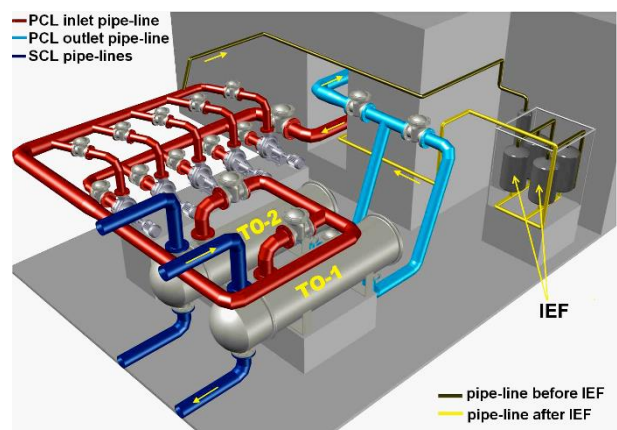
Layout of equipment in the PCL pump-premise (TO-1, TO-2 – HE).
